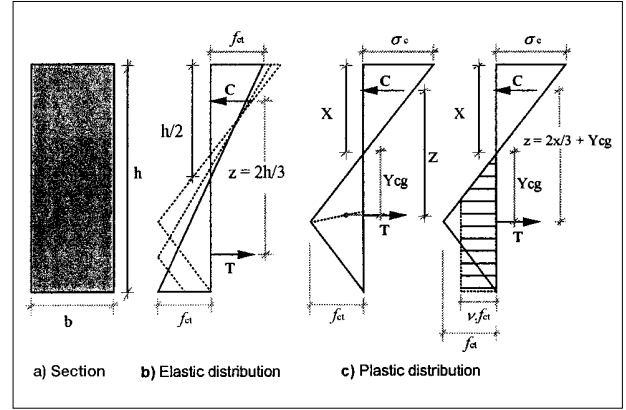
Stress distribution in a rectangular concrete section under cracking moment.
